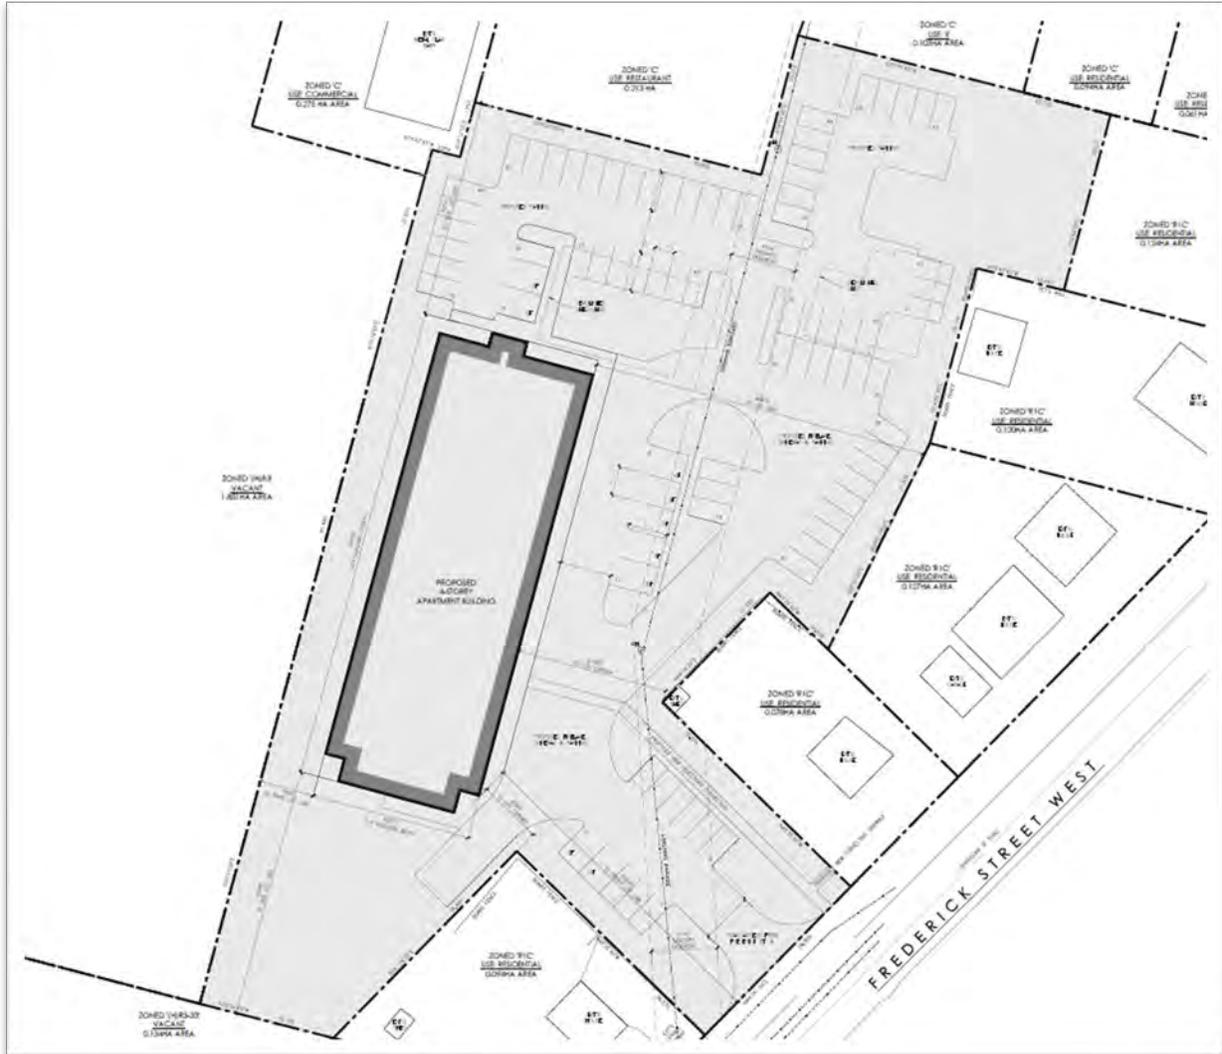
Site plan submitted by Grinham Architects, August 18th, 2022
